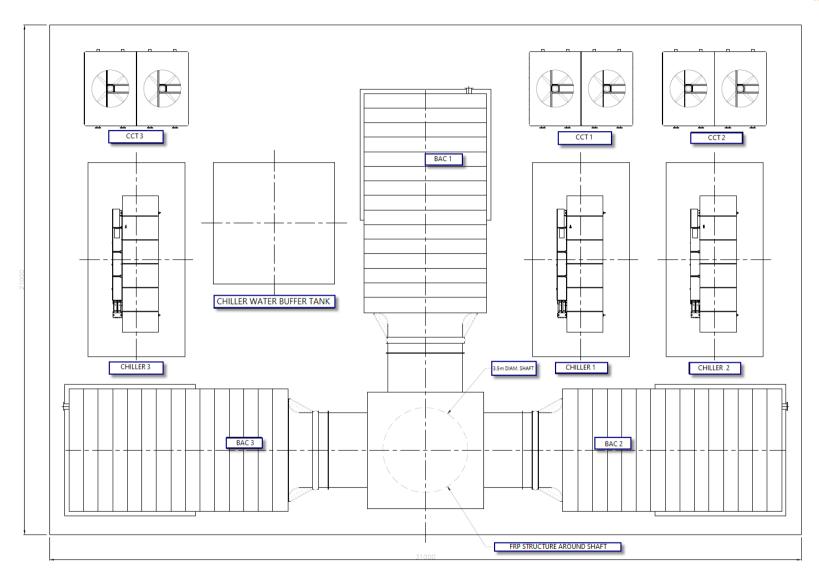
General Arrangement Drawing of a Typical Refrigeration Plant (IWC)
